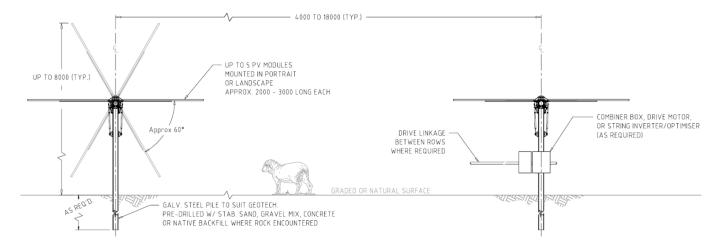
Indicative single access tracking system elevation (not to scale)
